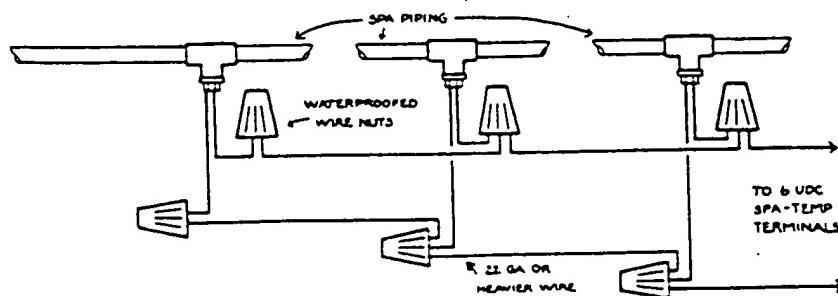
MULTIPLE SENSOR INSTALLATION
